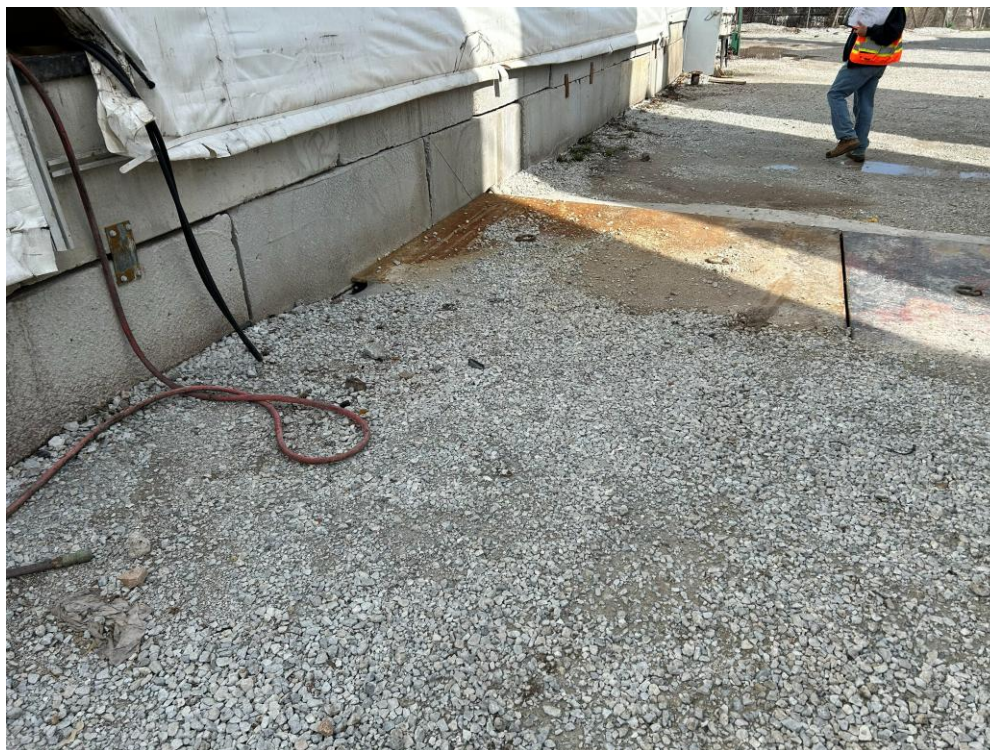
underground pipes from Skimmer 1 and Skimmer 2 to concrete dome building containing evaporator system
